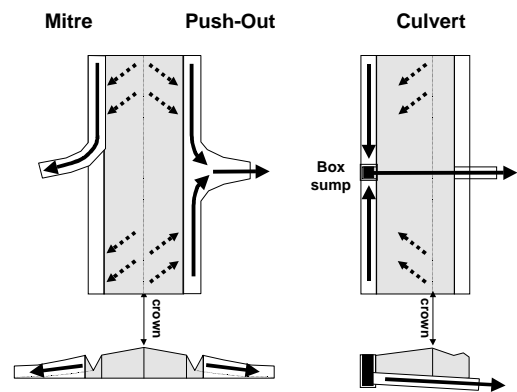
Plan and cross section schematic of mitre, push-out and culvert drain types. Shaded area represents the road surface and dashed arrows show direction of road runoff. Solid arrows show discharge from drain structure[0].
